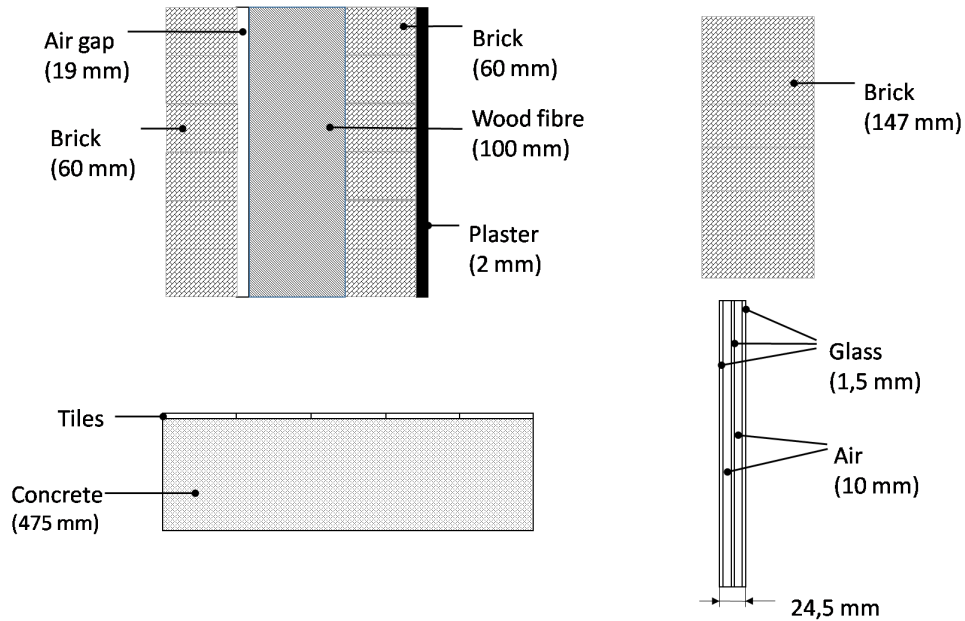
Room walls in Skelleftea school demo site. Top Left (a): façade, top right (b): interior wall, bottom left (c): floor and bottom right (d): Window
